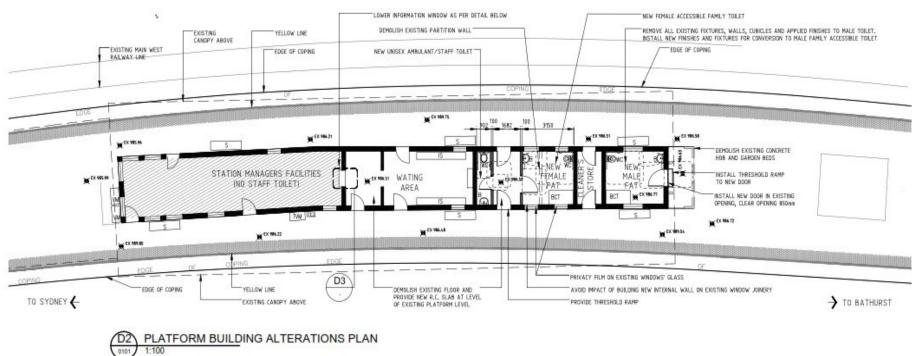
Plan view of key elements of the Proposal (indicative only, subject to detailed design)
